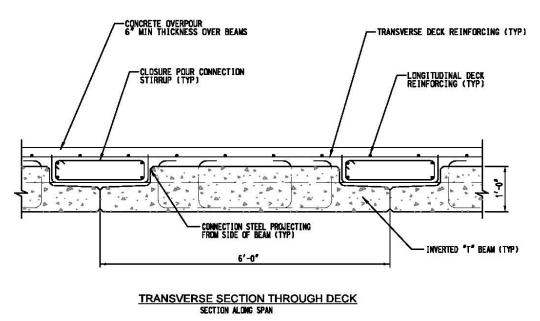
Connection Details for a Precast Inverted Tee Beam (FHWA, 2013a)
